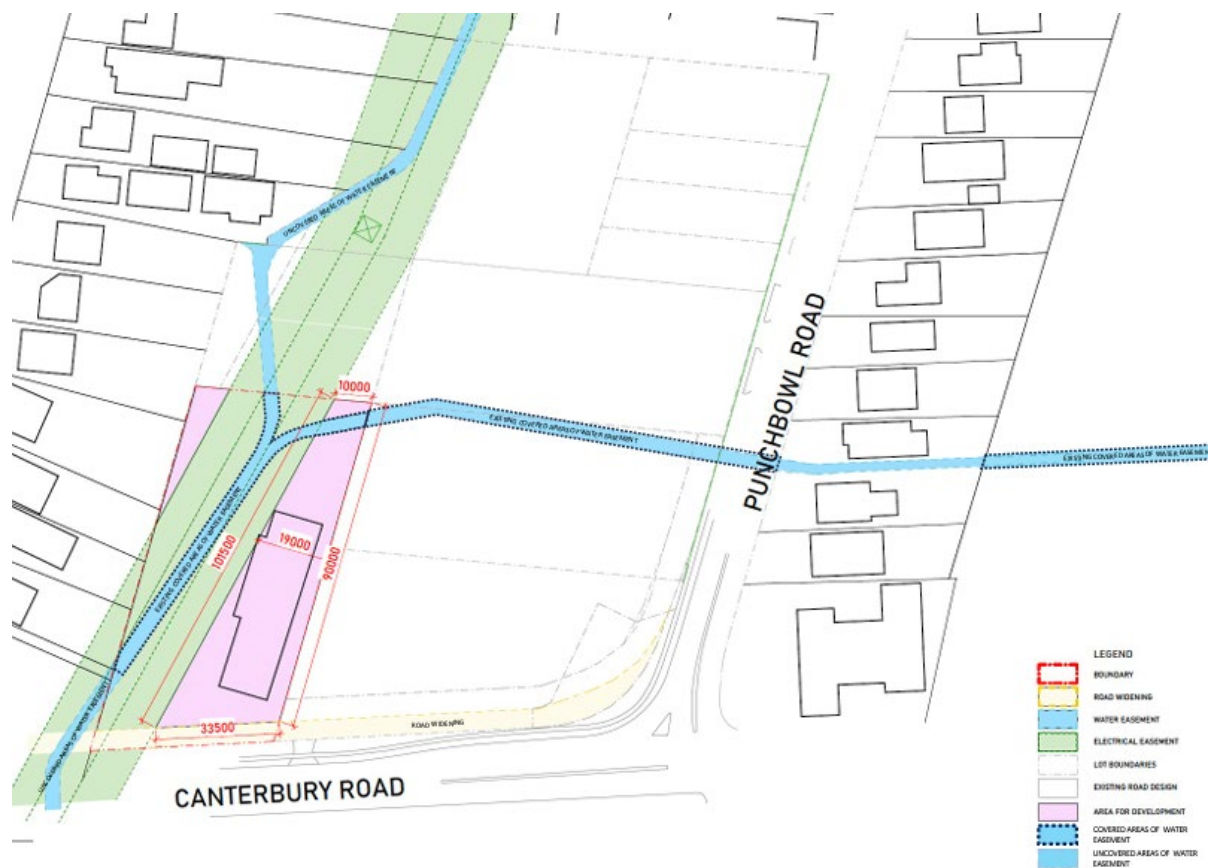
Developable area, as outlined in pink, and site constraints for 23 Canterbury Road.
